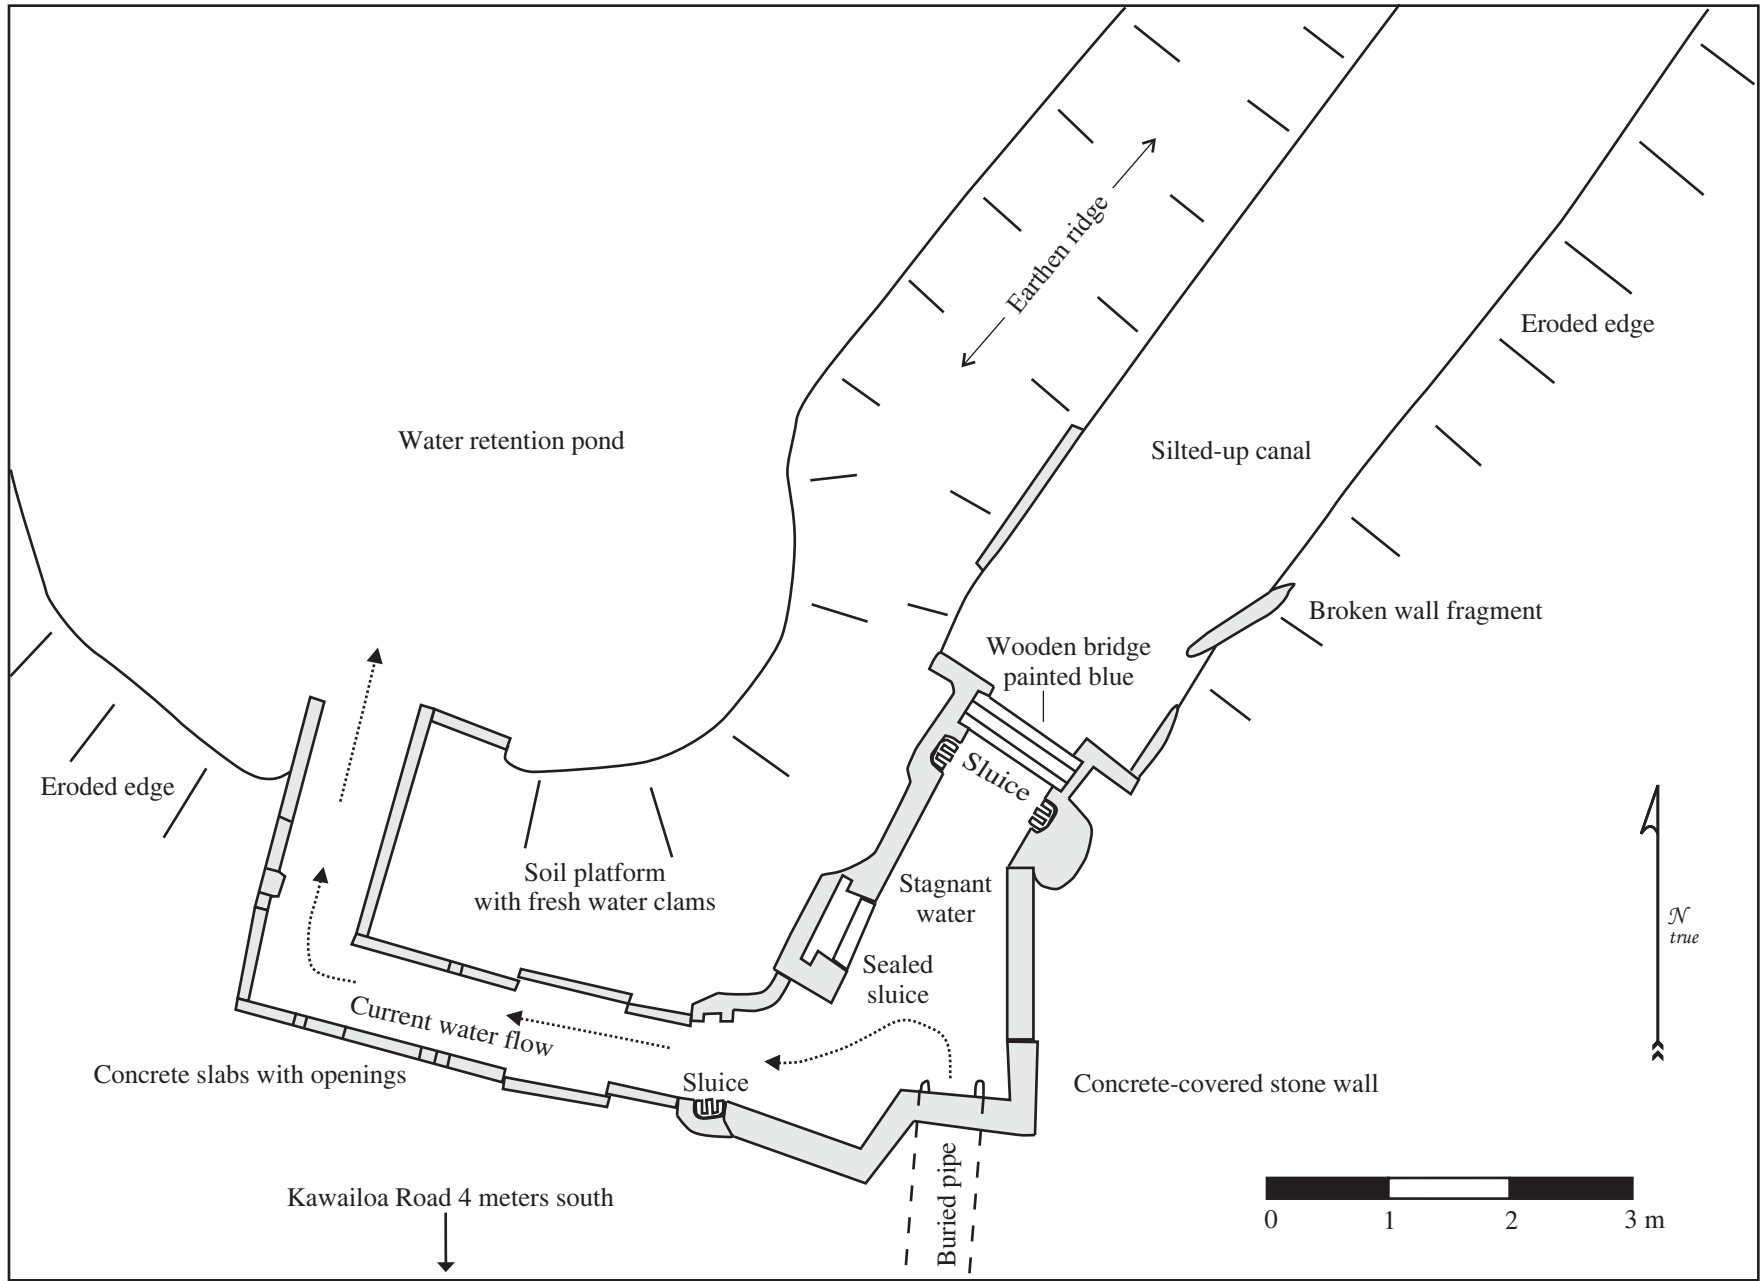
Site 7159 Section 7 north sluice gate complex plan view.
